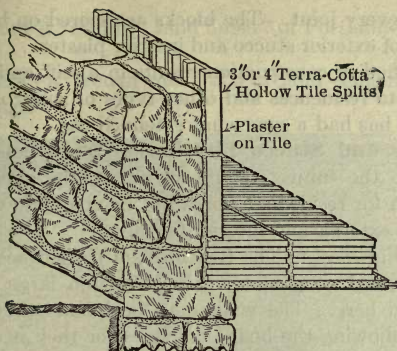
Stone Wall Construction with Hollow Tile Furring.
